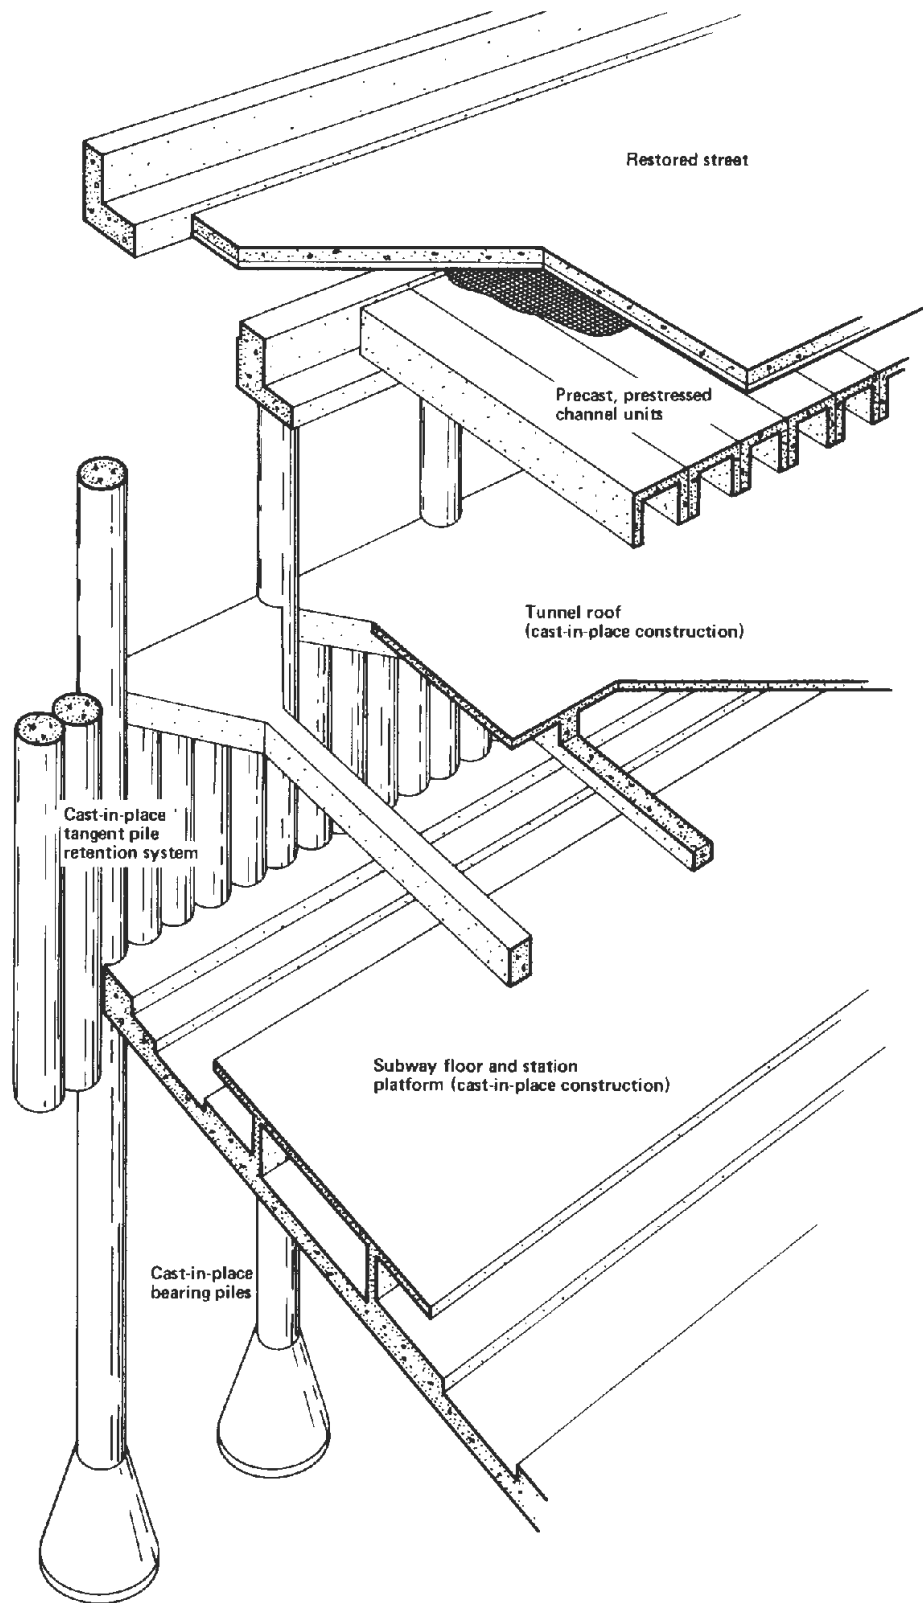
Jasper street subway station construction, Edmonton, Alberta.
